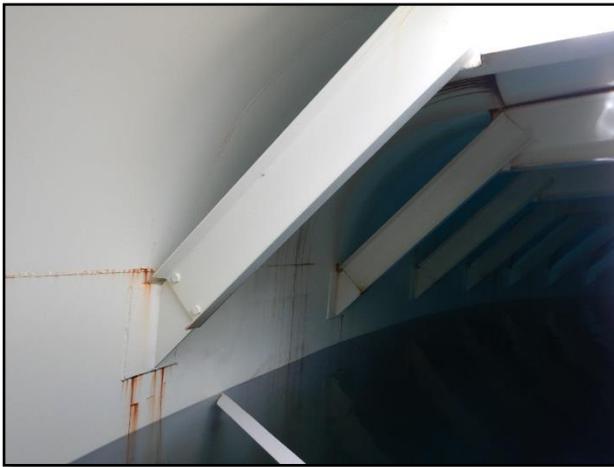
Minor corrosion at the weld of the beam to the knuckle.
